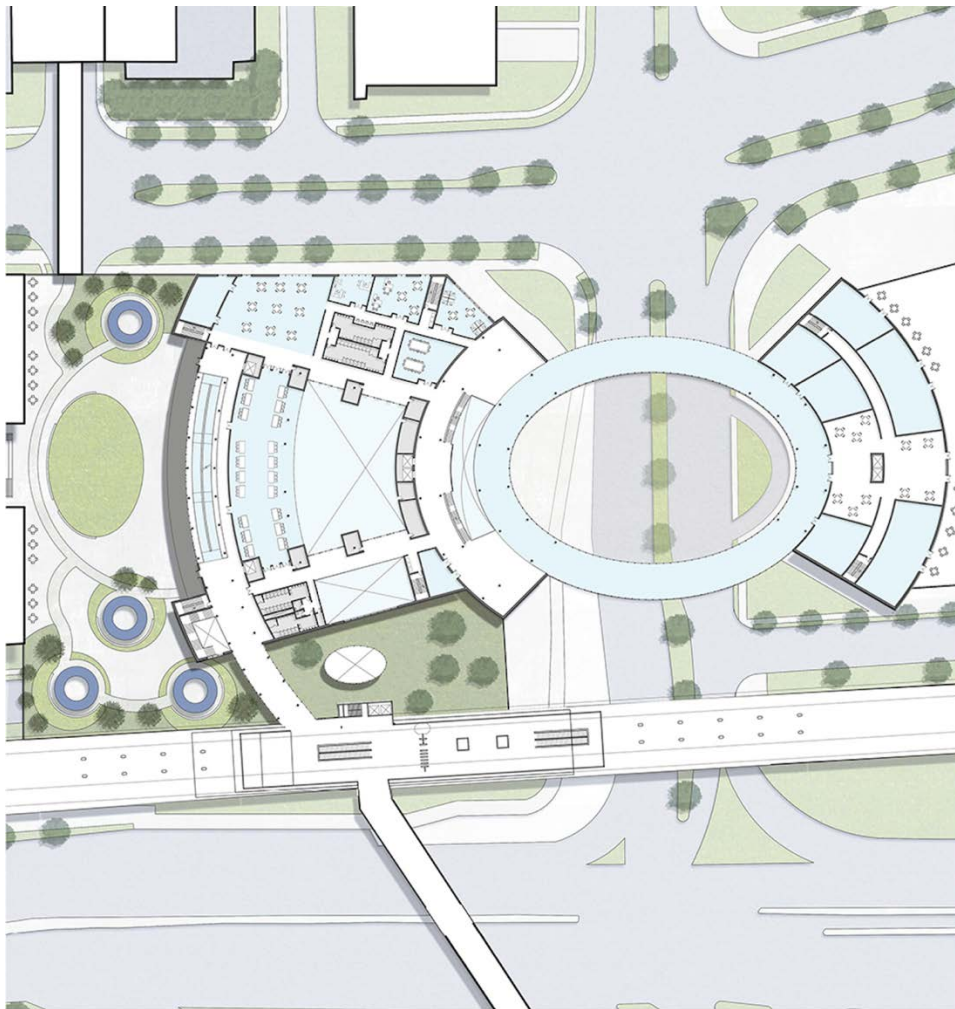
Third Floor Plan – Level-Up Courtyard & Metro Ticketing Level (Source: Jefferson Choi)
